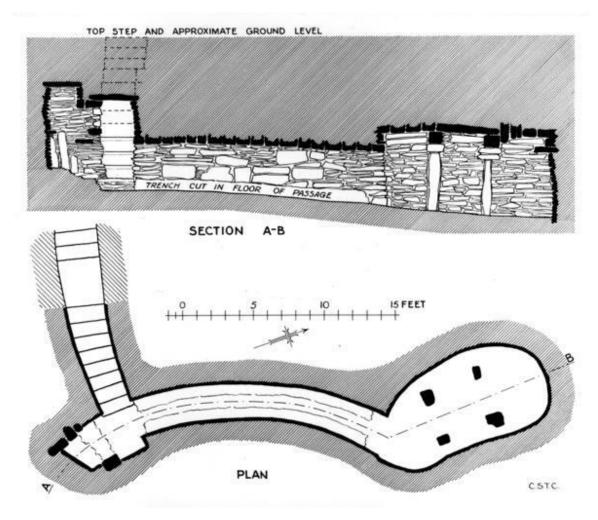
c.1920 RCAHMS publication drawing: plan and section of Grain Earth House. Note line of modern interventions inc. additional stairs and lowering of entrance passage floor. © Crown copyright: HES.
